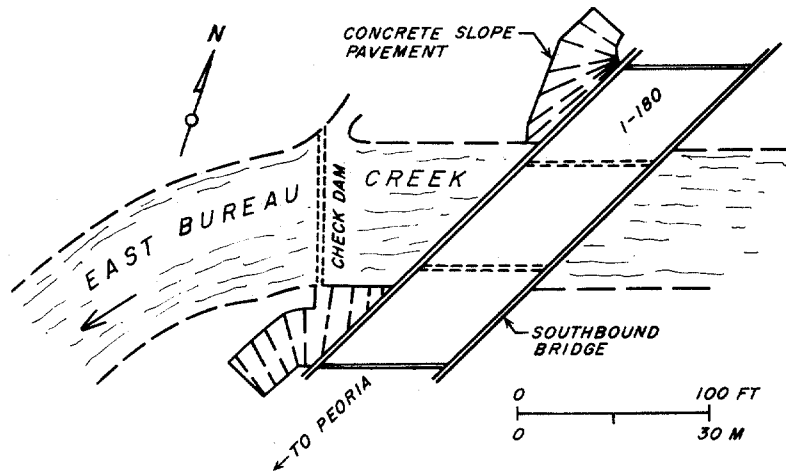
Plan sketch of southbound I-180 bridge showing placement of concrete slope pavement on downstream side of bridge, and position of check dam built in 1974.
